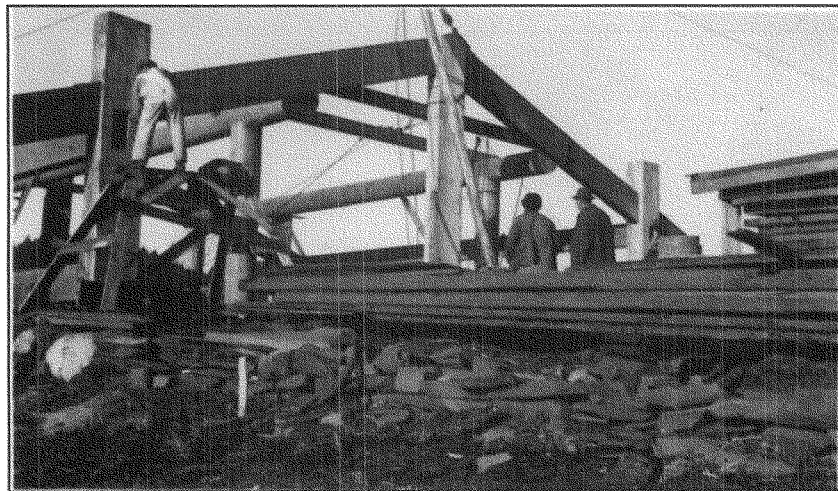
Construction of Chief Shakes Tribal House, Wrangell, AK. 1940. (Unknown 1940b)
